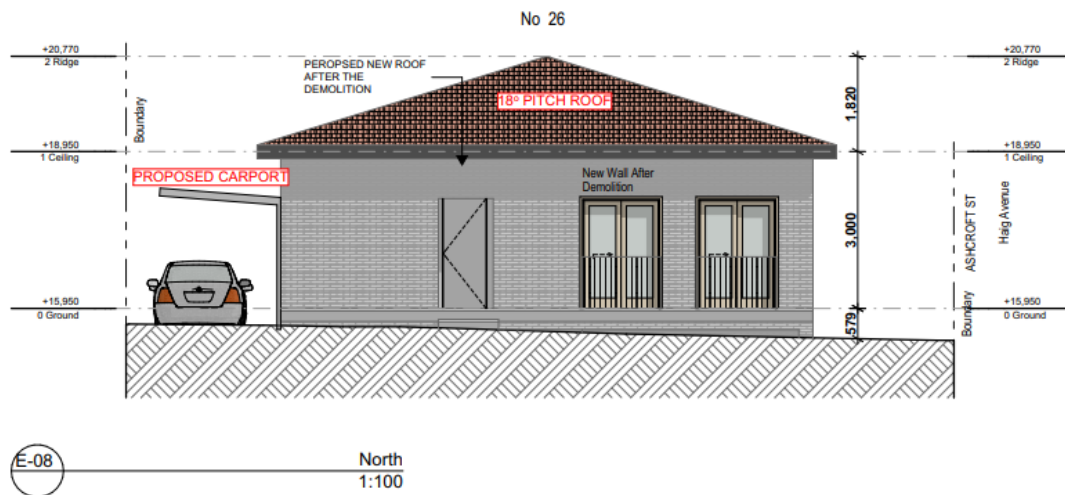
Extract of proposed elevations of retained dwelling (Source: Premium Design and Engineering, 2022).
